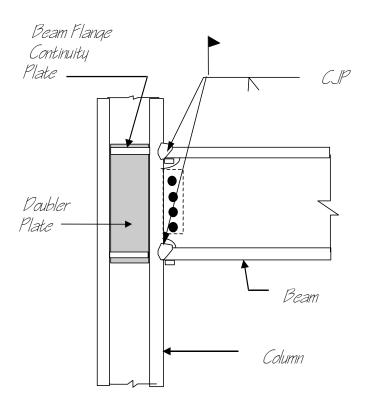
Welded Unreinforced Fully Restrained Connection (pre-1994)
